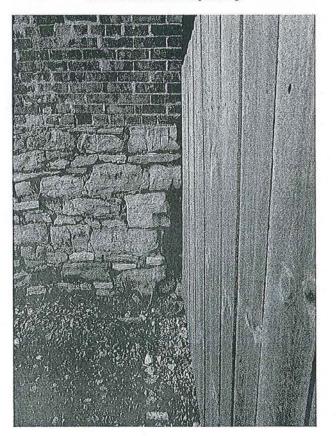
north wall foundation has loose bricks but settlement is not apparent
